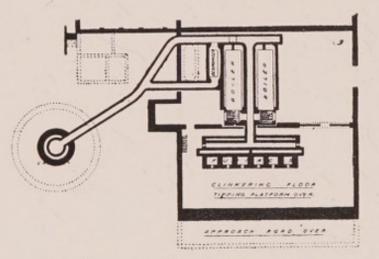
ACCRINGTON COMBINED DESTRUCTOR AND ELECTRICITY WORKS. Plan.
